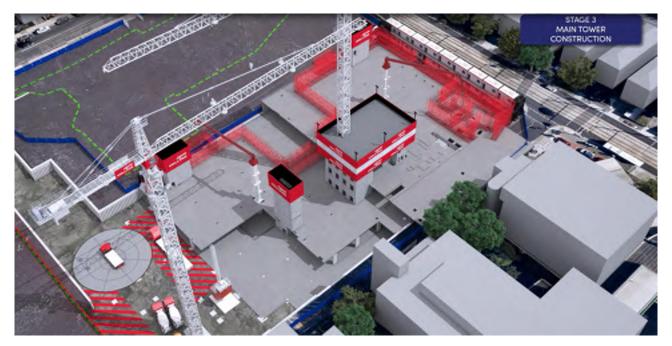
Tower Crane No 1 in the centre of the image and Tower Crane No 2 to the bottom left (John Holland)
